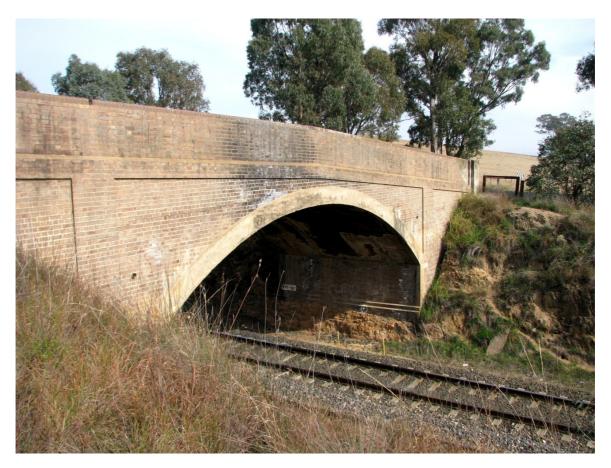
F73 Brewongle long single arched brick and possibly concrete bridge
